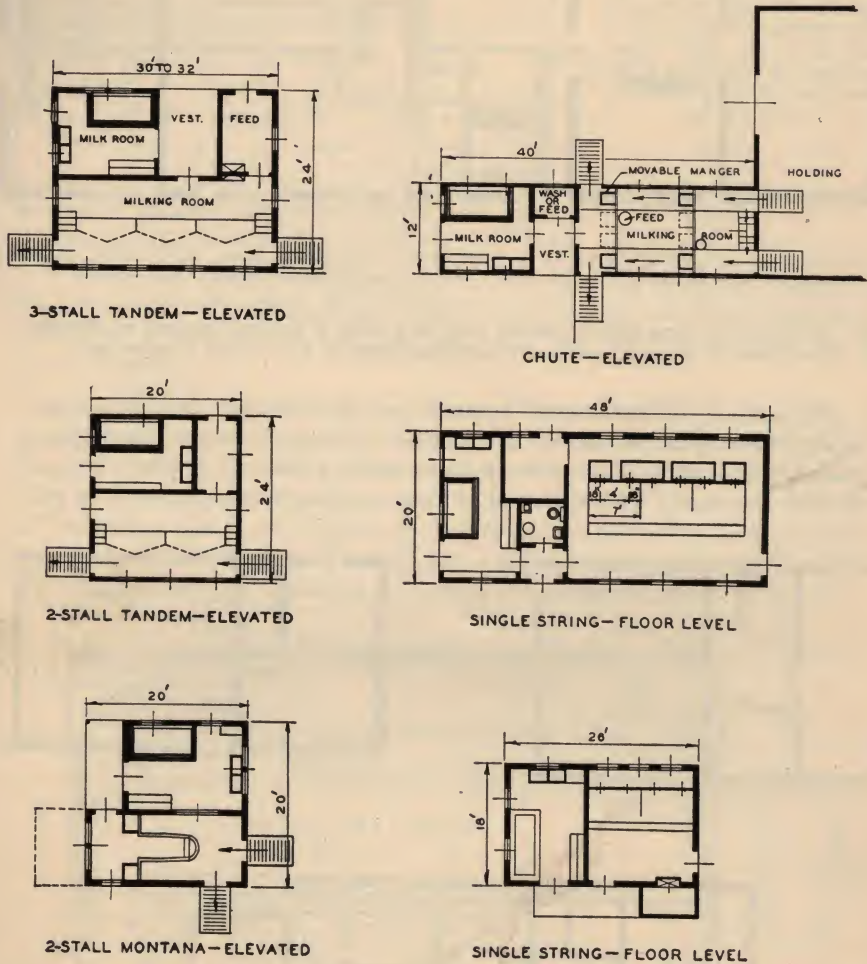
Typical farm milking plant layouts: 1. 3 stall tandem parlor with elevated stalls; 2. 2 stall tandem parlor with elevated stalls; 3. 2 stall Montana type parlor with elevated stalls; 4. Chute type parlor with elevated stalls; 5. 6 stall floor level milking parlor; 6. 4 stall floor level milking parlor.
